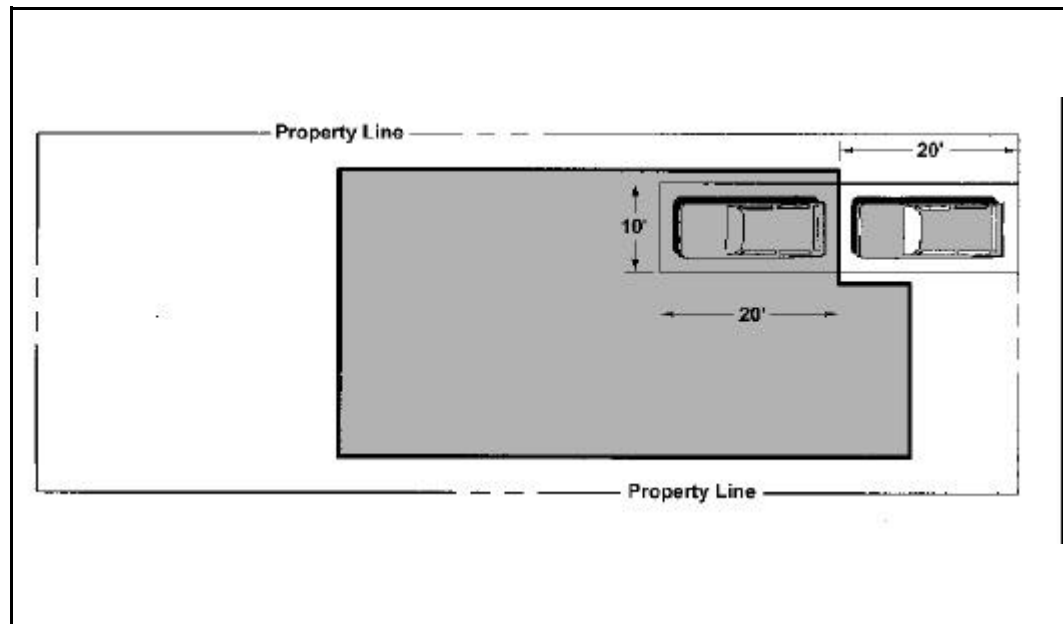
Parking Space Shown in Front Yard Area with Minimum 20' Setback to Building
